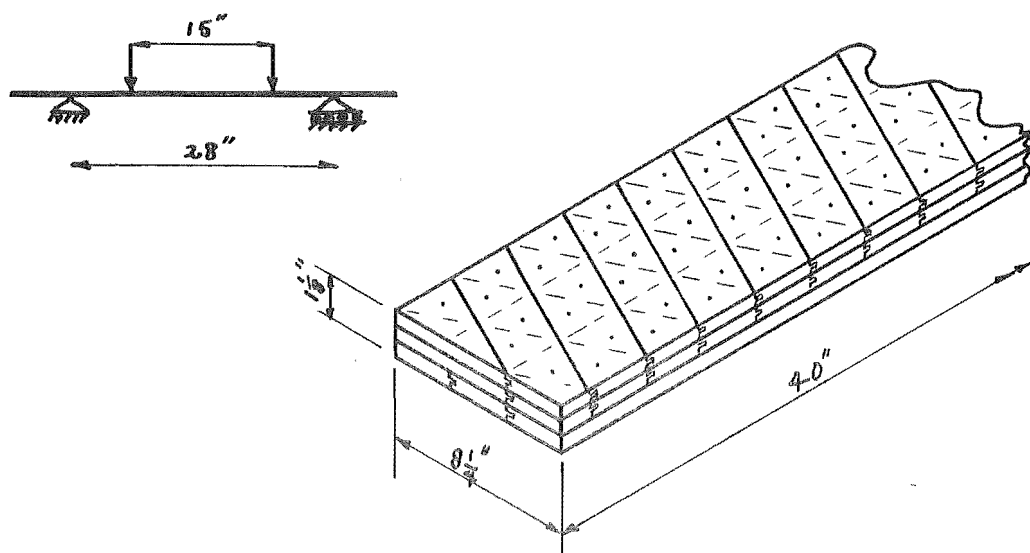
Element and loading arrangement for bending tests conducted by Lee.
